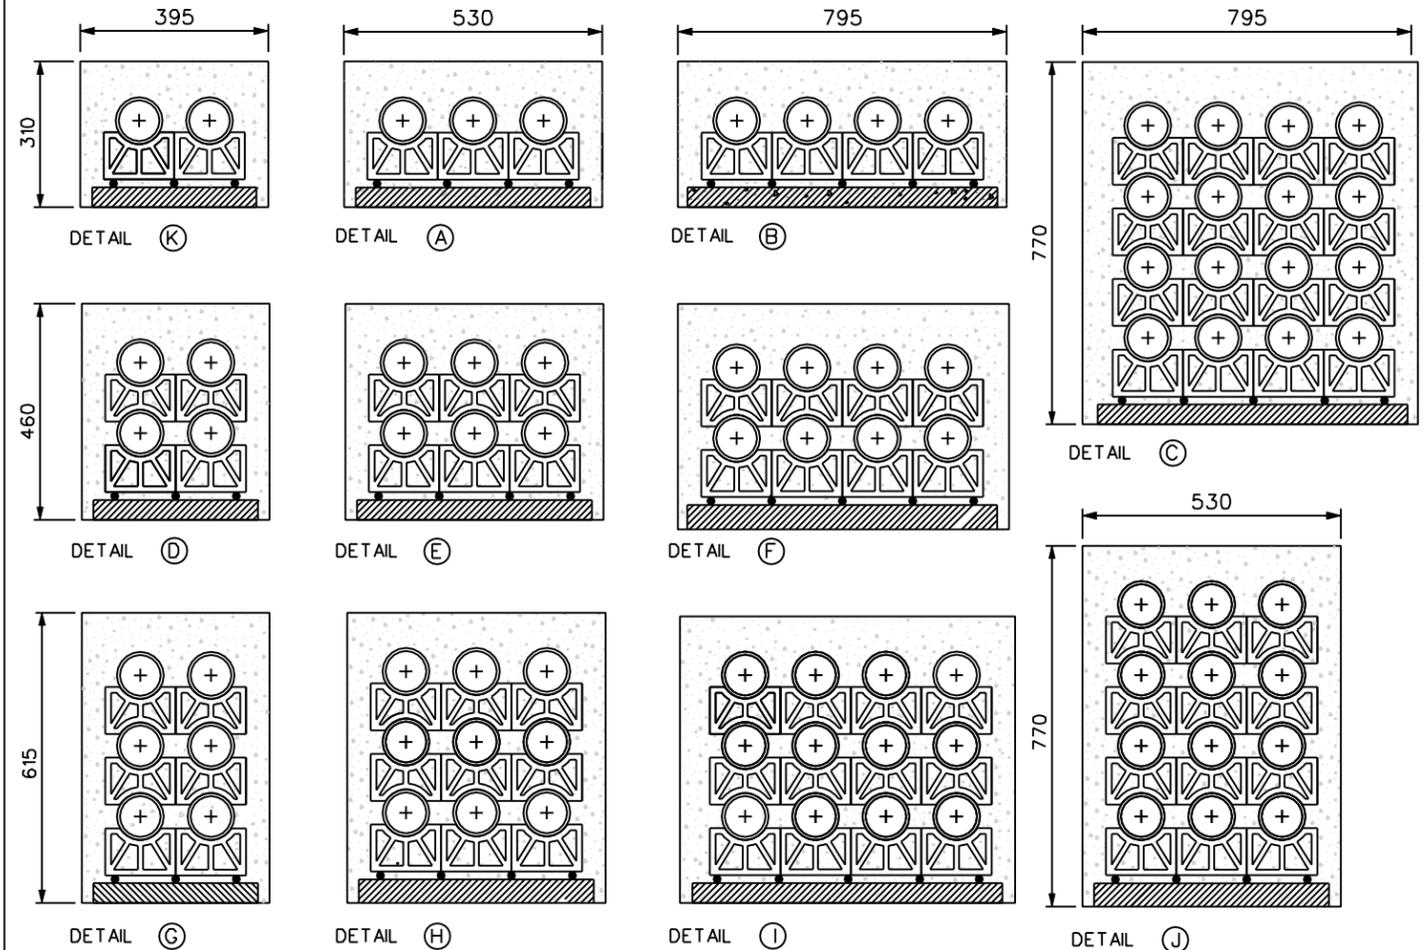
TYPICAL CONCRETE DUCT BANK SECTION VIEW
